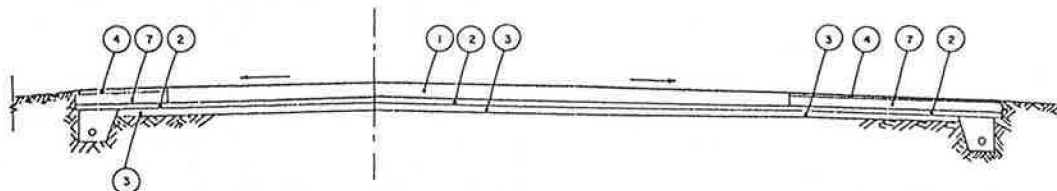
Internally drainable road cross section with drains at the edge of pavement.
